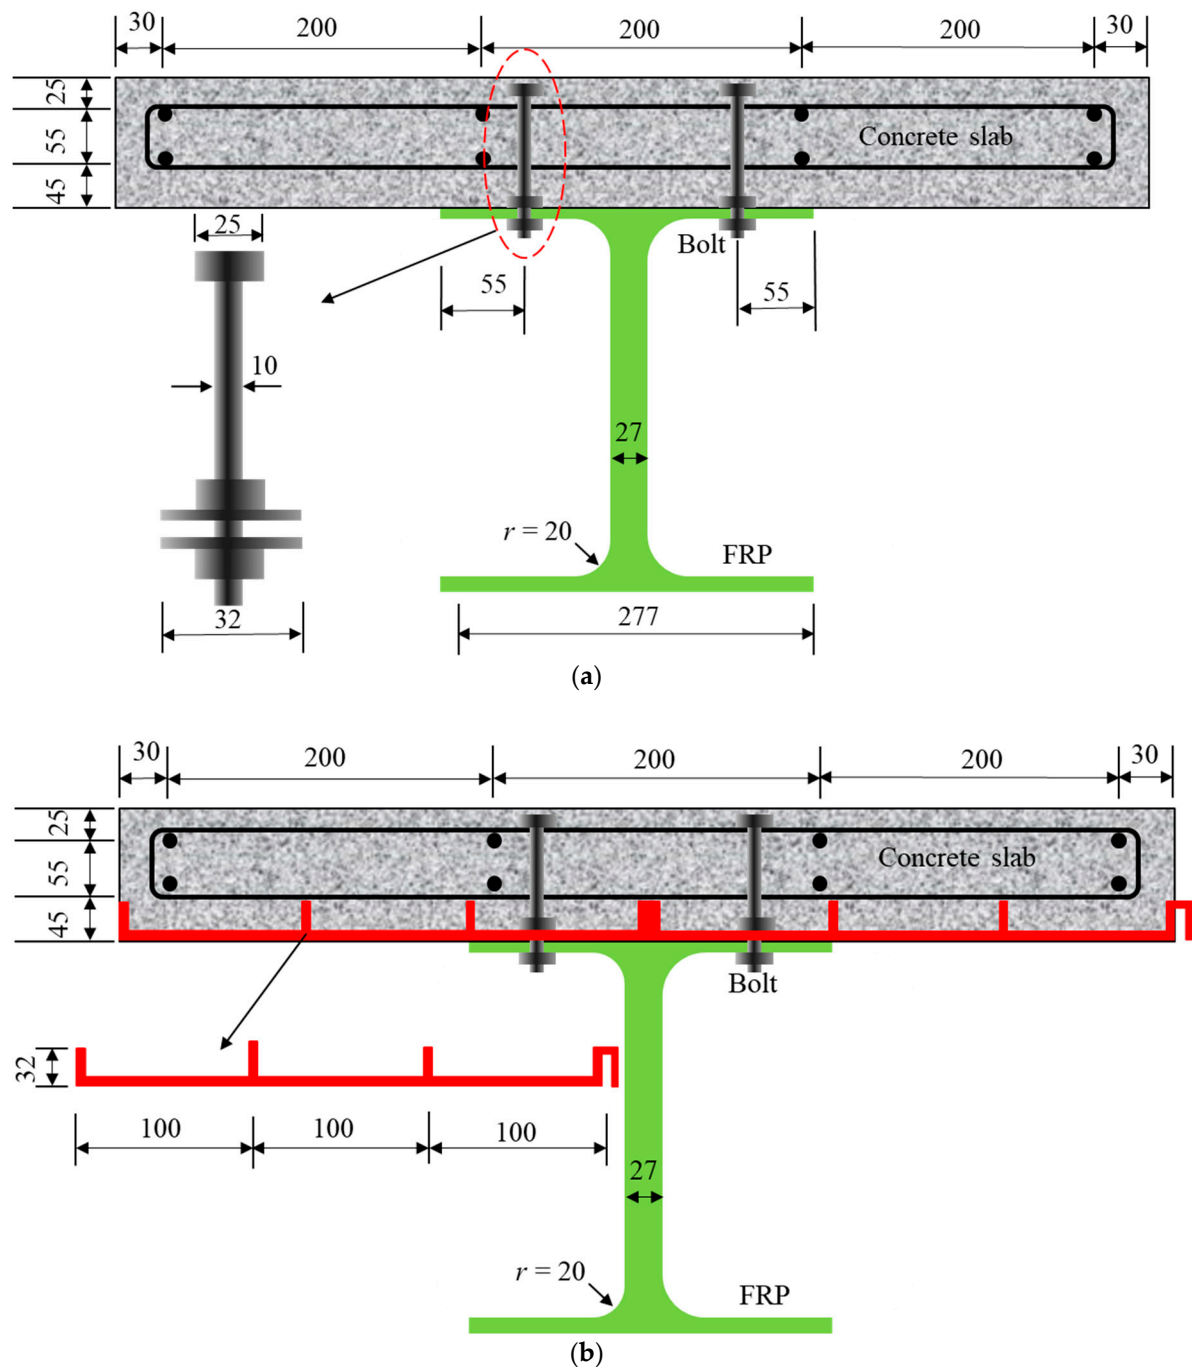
Cross section of (a) Beam 1, and (b) Beam 2 (units in mm, not to scale).
